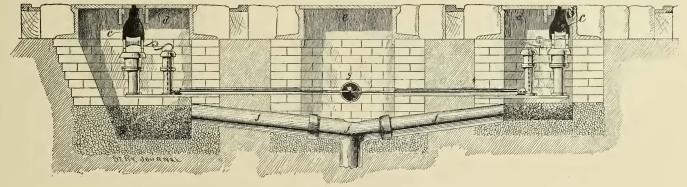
MUNSIE-COLES ELECTRIC RAILWAY CONDUIT SYSTEM.
